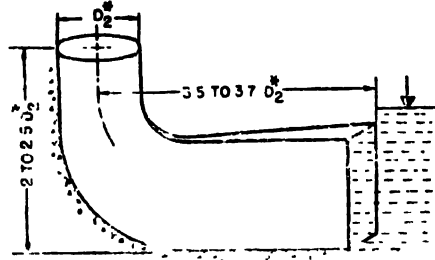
(e) Elbow Tube having Circular Cross-section at Inlet but Rectangular at Outlet
